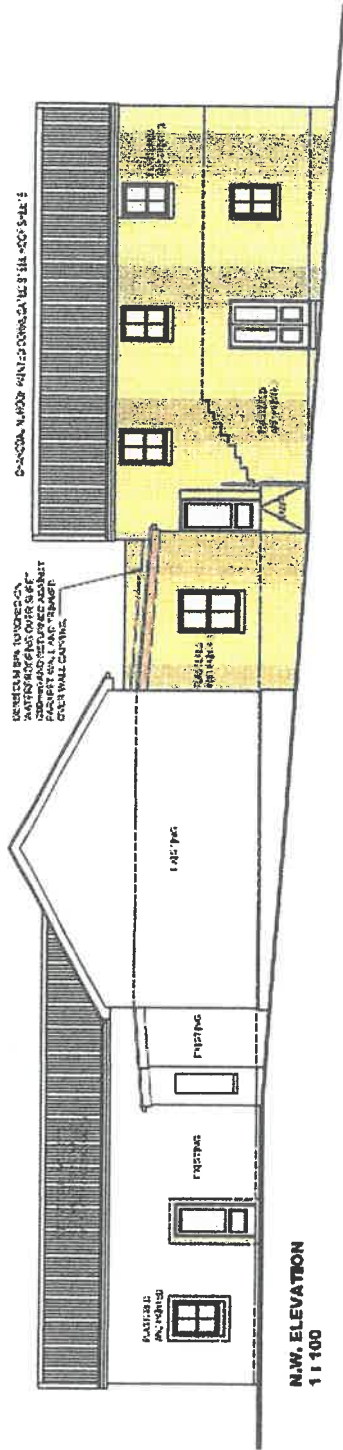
NORTH-WEST ELEVATION OF PROPOSED BUILDING ADDITIONS ON ERF 230 FRANSCHOEK
